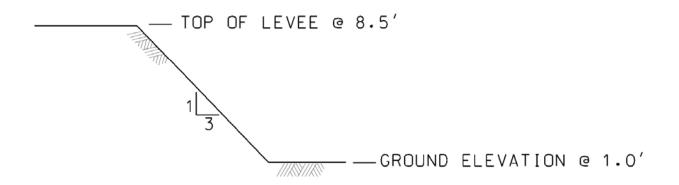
Typical Levee Design Cross-sections Algiers Canal Levees (WB30-L1 and WB30-L2)
